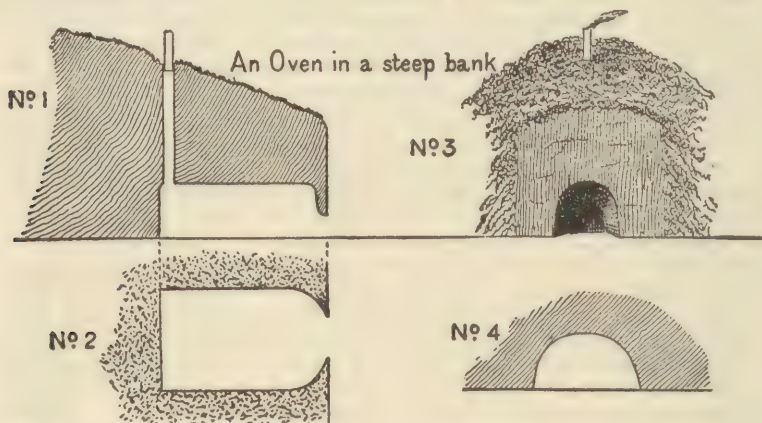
Extemporary oven built in a bank. No. 1, longitudinal section; No. 2, plan; No. 3, front view (Not on the scale); No. 4, transverse section of interior.
